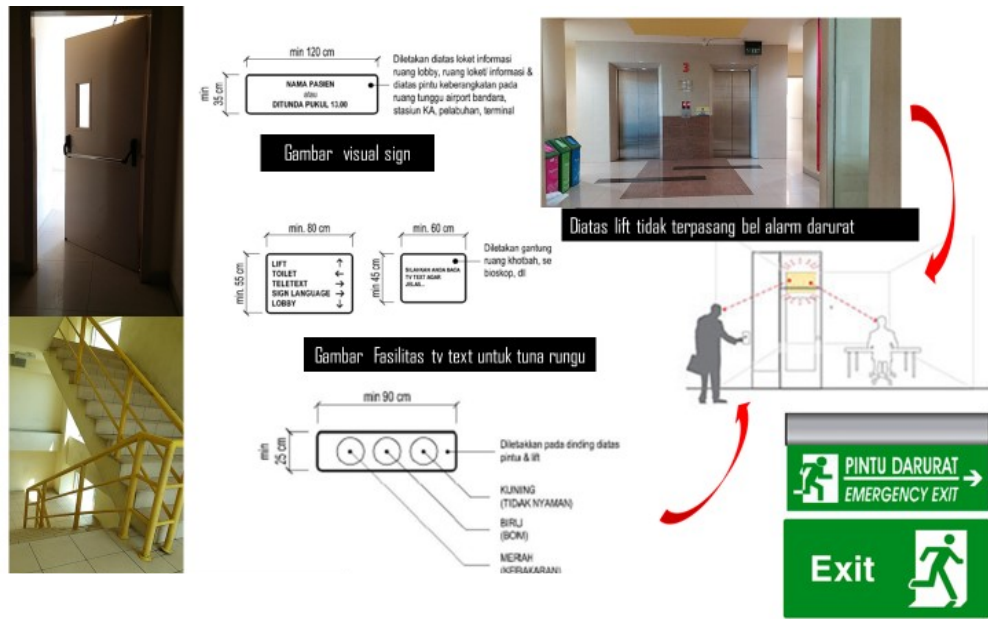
Access of evacuation system and emergency staircase leading up to the door at Tower building and instruction board isn't provided. The proposed design on the detail picture of the size of the toilet.
